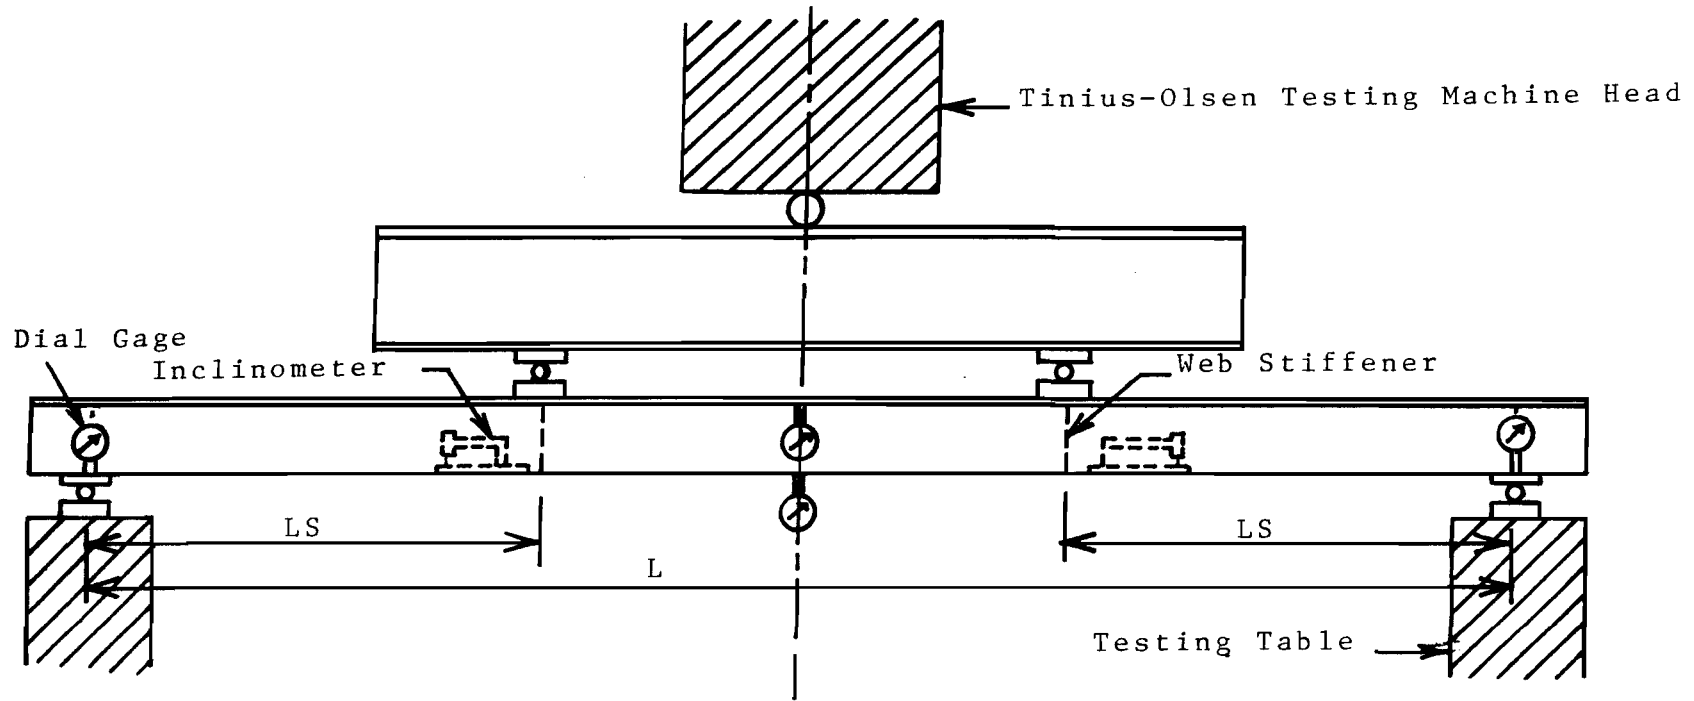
BEAM TEST SET-UP AND INSTRUMENTATION
